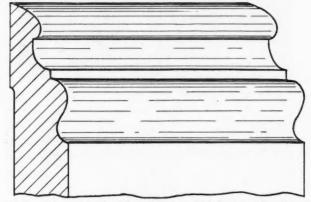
Base of Fine Cross Section but Poor in Elevation
